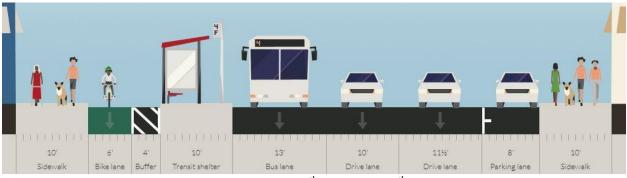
Folsom Street section view between 5th Street and 4th Street with bus stop looking west
